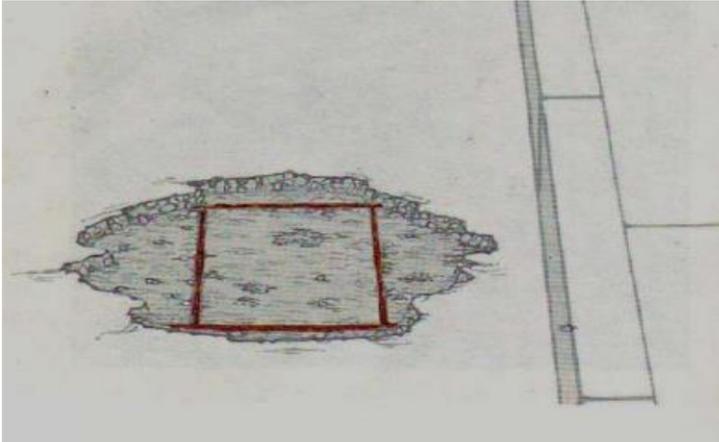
Spalling on the Concrete Surface
